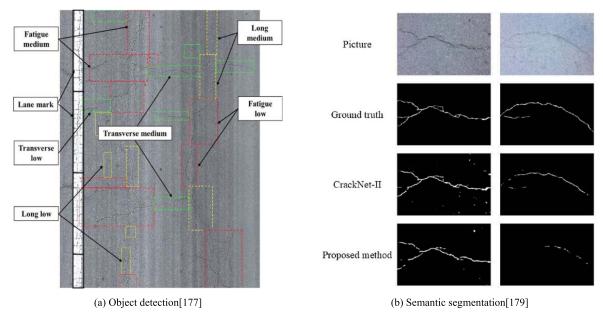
Pavement crack detection based on object detection and semantic segmentation.
